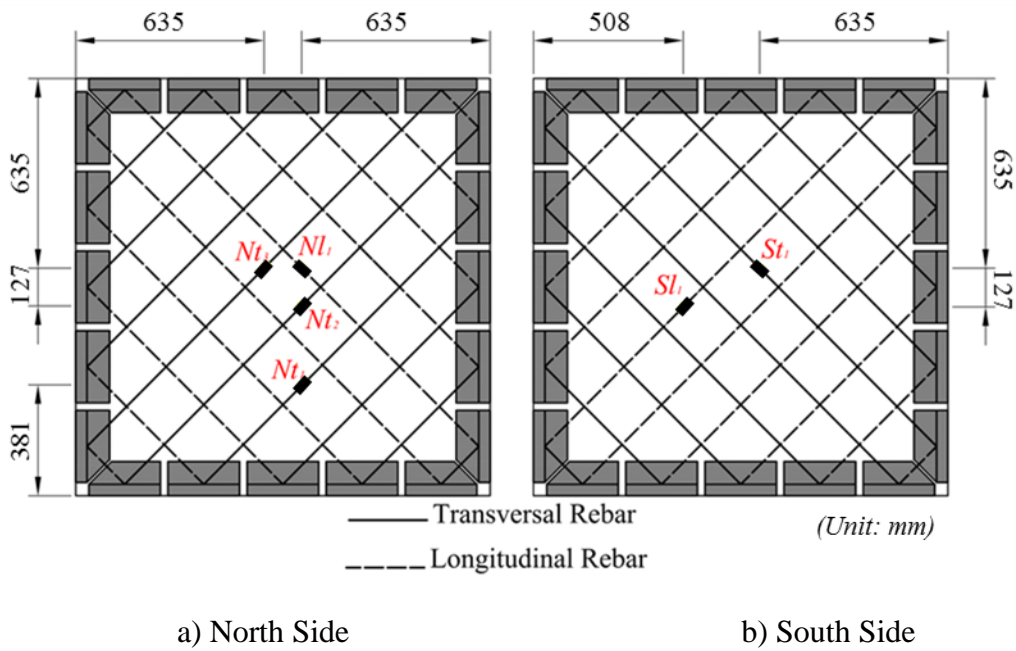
Strain gauge layout on steel rebar of panel specimens
